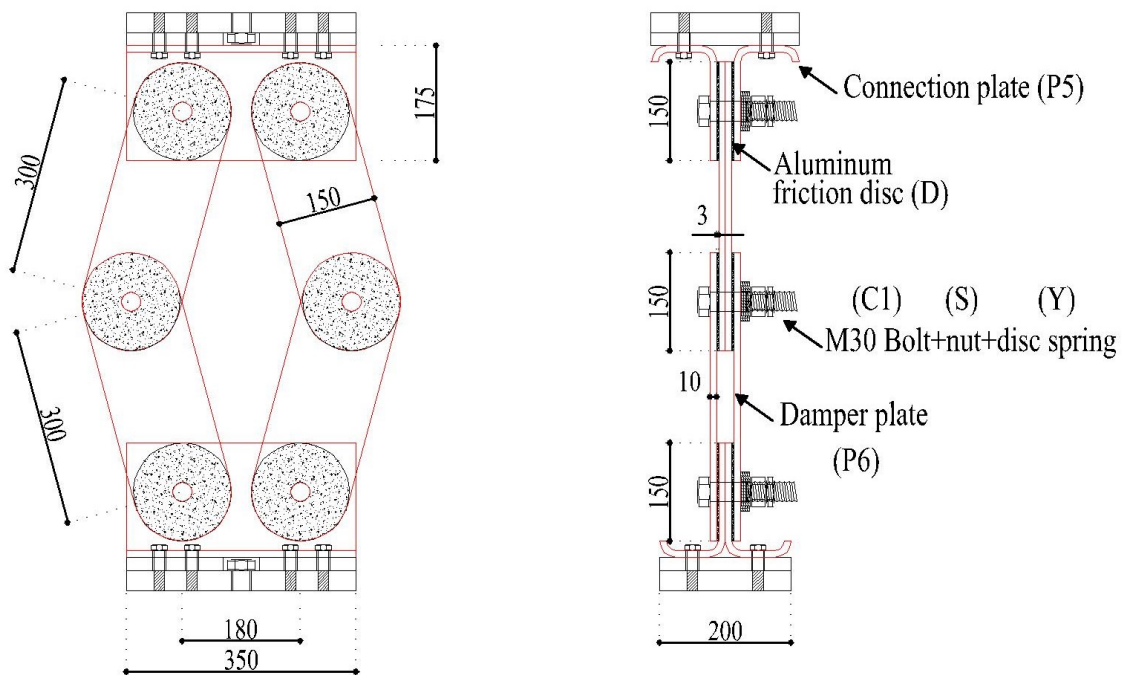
Dimensions of the prototype damper mechanism. (All units are in mm)
